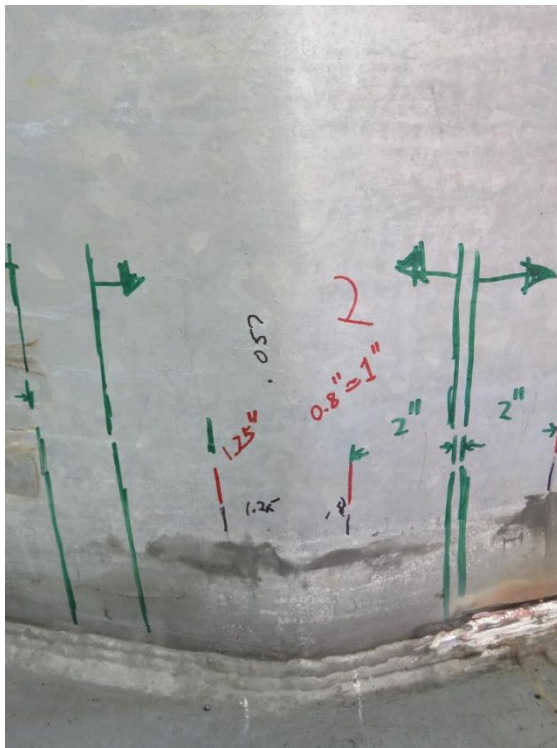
State of Cracks: Specimen 33-3-12-TX-A3 – Bend 2
